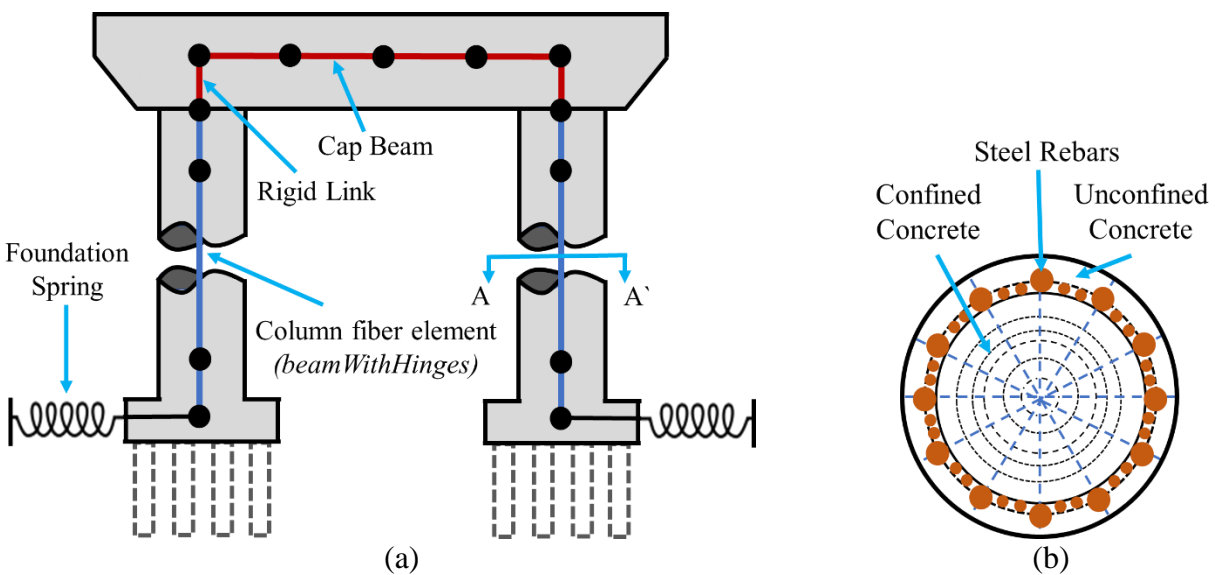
a) Details of Bent, b) Column fiber section at AA'
